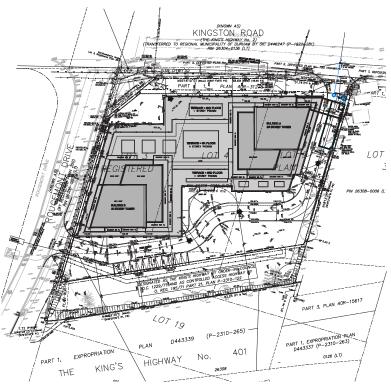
Proposed Site Plan, prepared by Richmond Architects Ltd.
